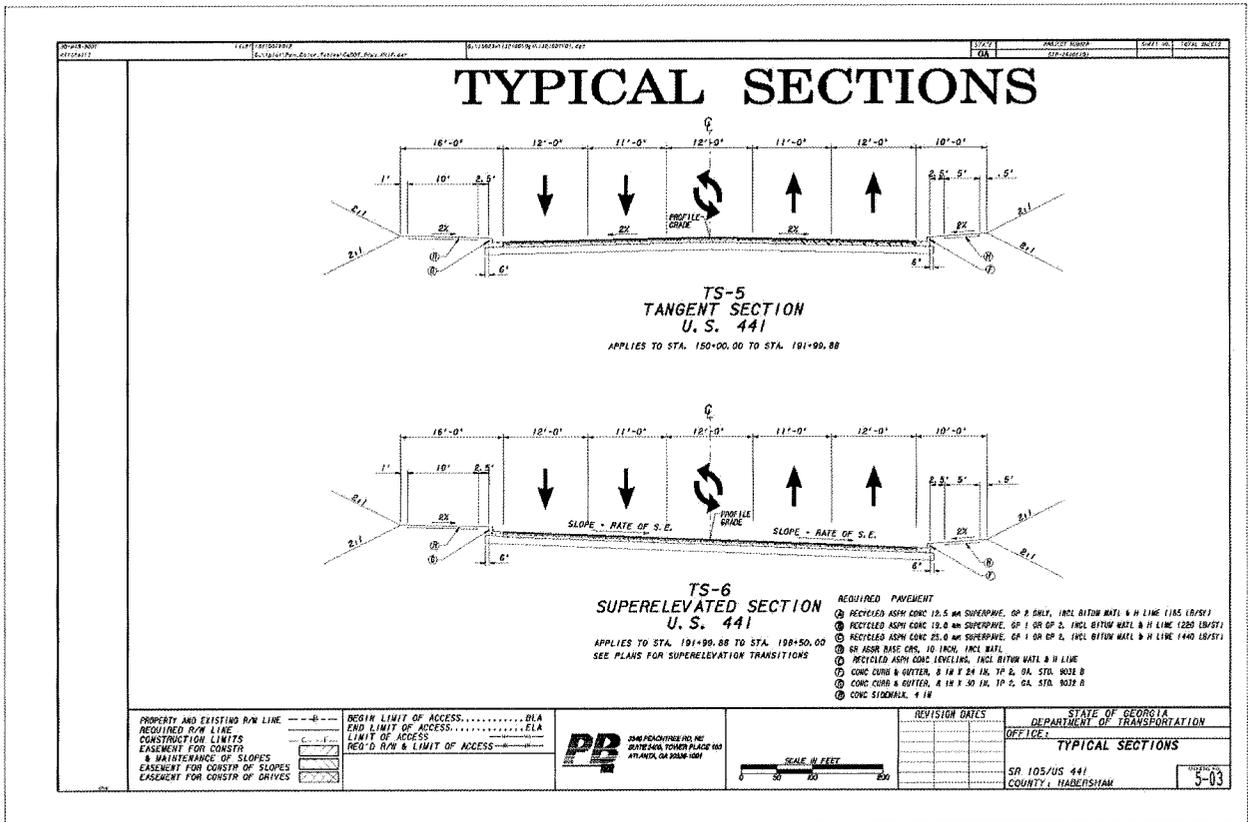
Typical Sections, SR 105/US 441 from SR 365 to North Main Street
